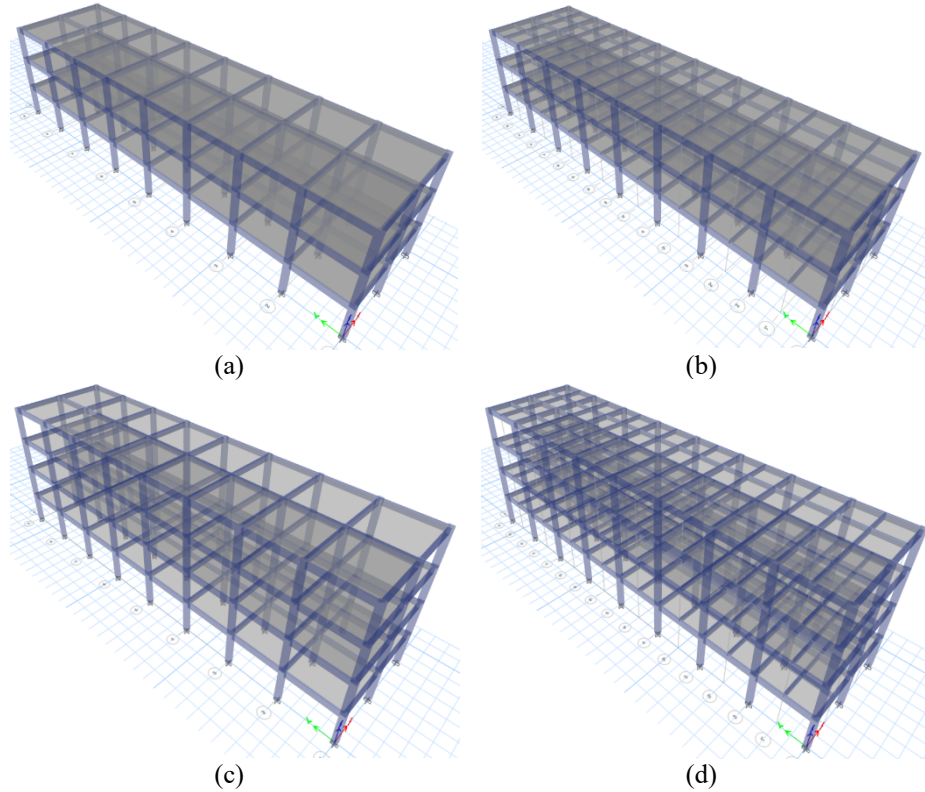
Representation of the structural system: (a) retrofitted with RC beams on the bay direction of the structure and elevated with one storey (Model_7); (b) retrofitted with grid RC beams system and elevated with one storey (Model_8); (c) retrofitted with RC beams on the bay direction of the structure and elevated with two stories (Model_9); (d) retrofitted with grid RC beams system and elevated with two stories (Model_10). (Note: The existing PRC frame system is Model_1).
